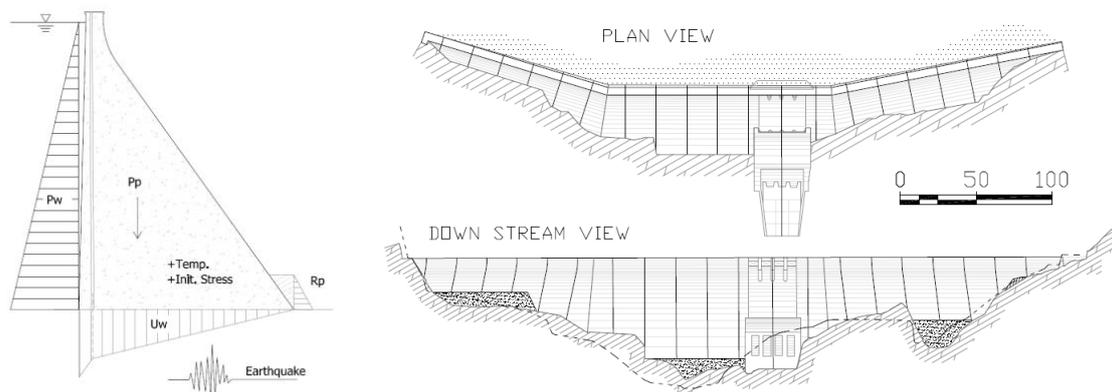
(Left) Section of the dam and main loads applied (right) plan and downstream view of the case study
